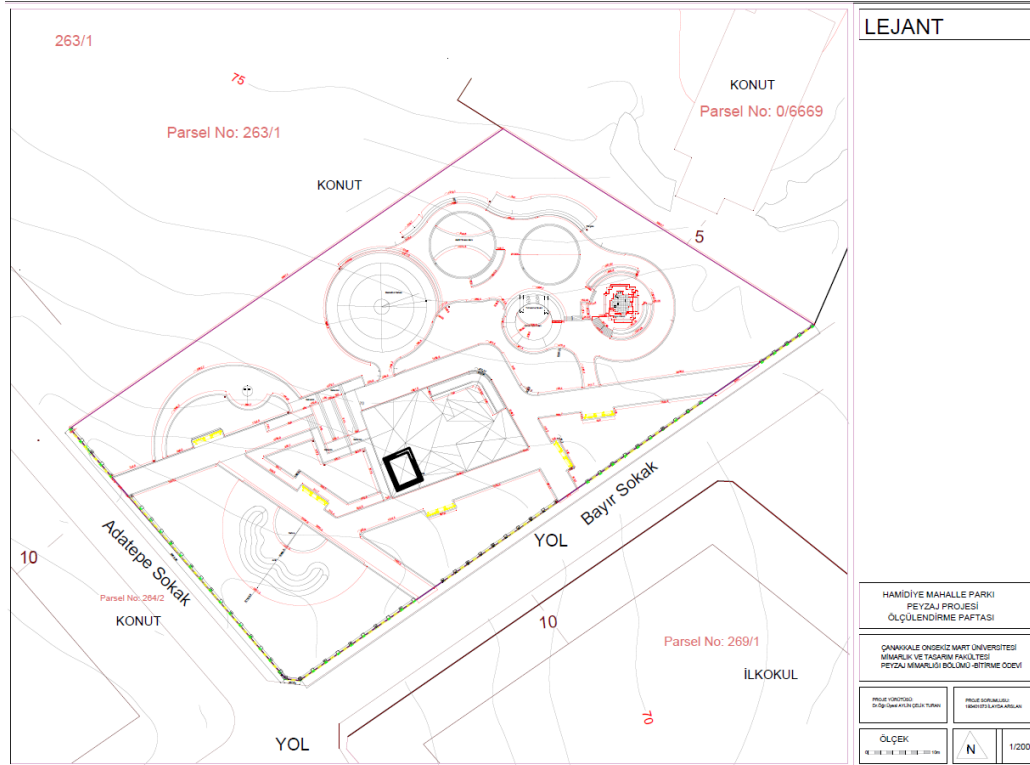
Dimensioning Plan (Created by İlayda Arslan usign Autocad 2022)
